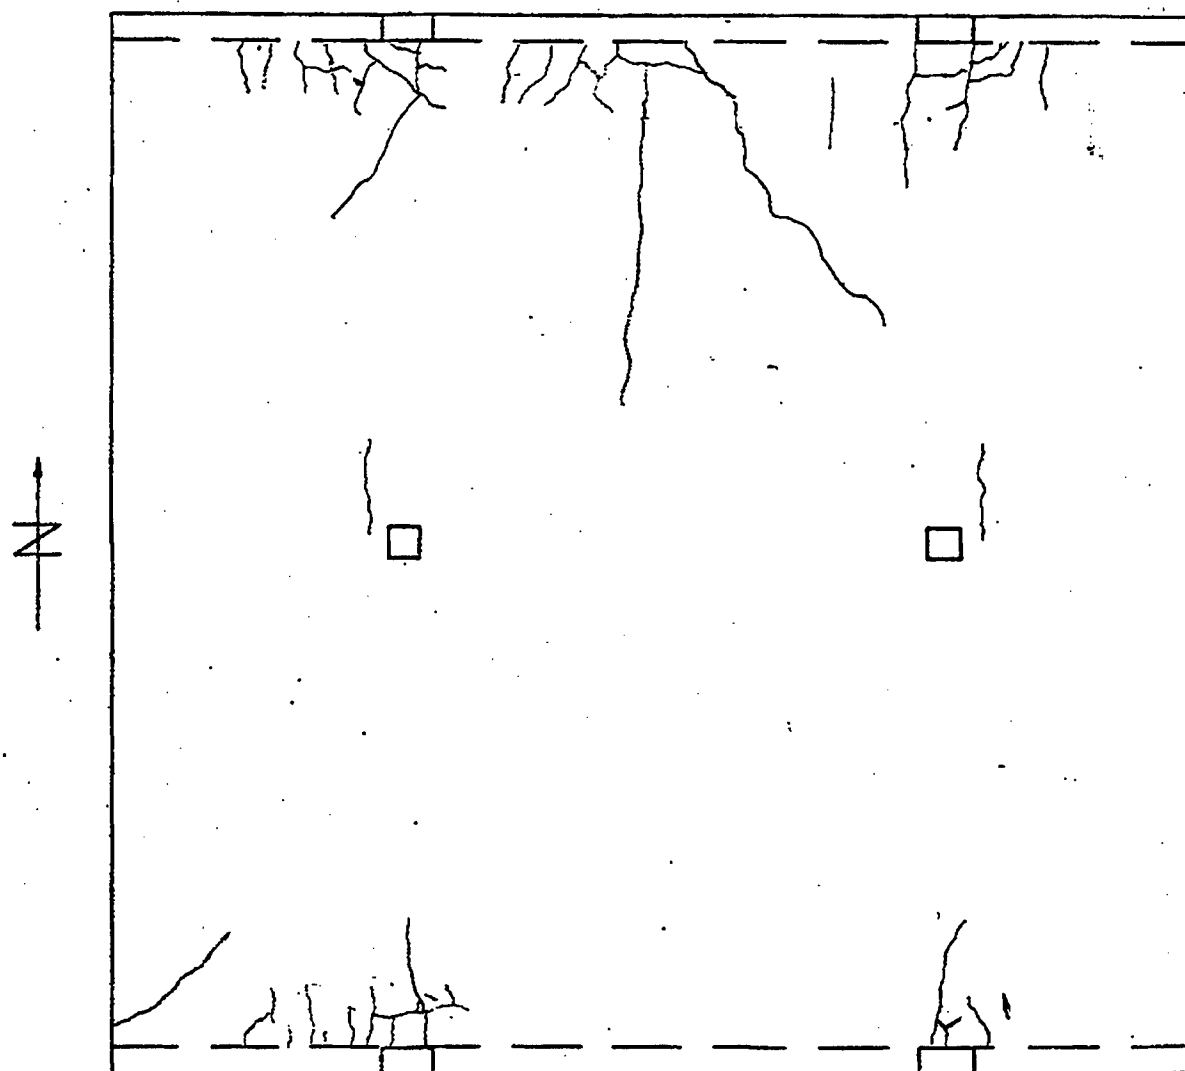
Crack Pattern, Third Floor Slab, Top Side, Post-T420DL
